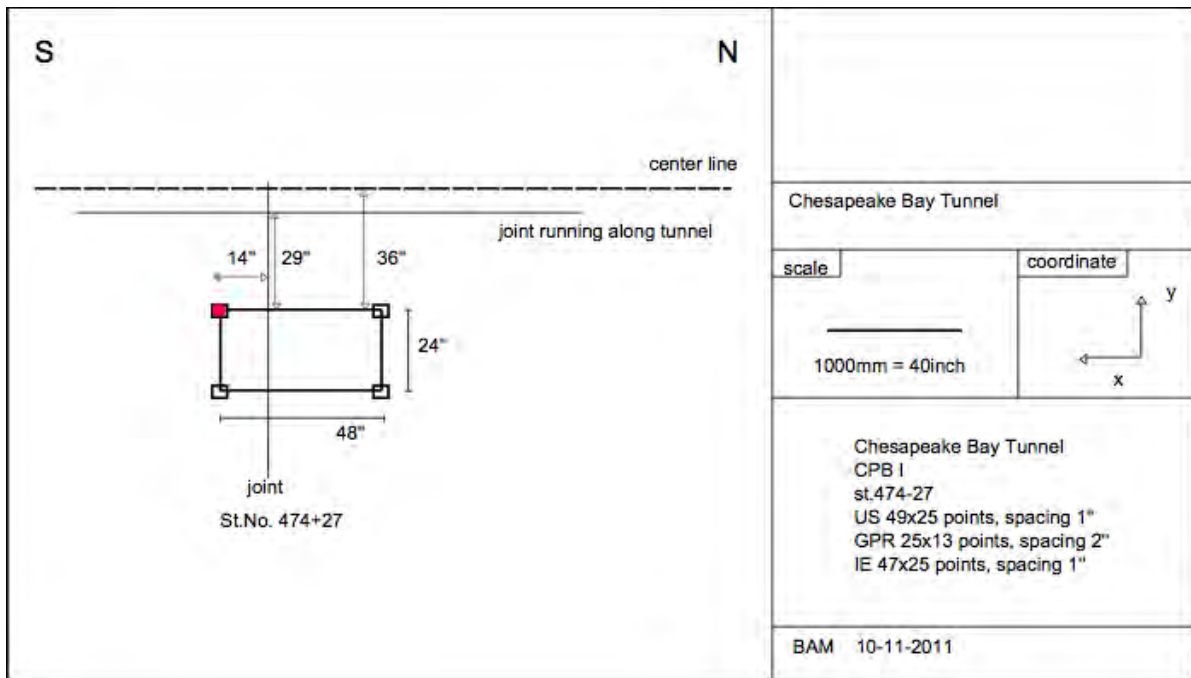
Sketch of Test Area CPB1, Sta. No. 474-27, Chesapeake Bay Bridge Tunnel.
